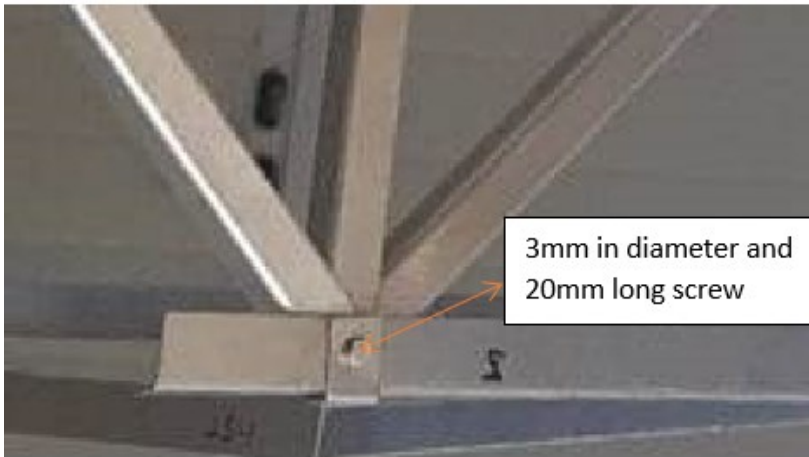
Pin joint, hole diameter 3.3mm and screw M3 20mm length
